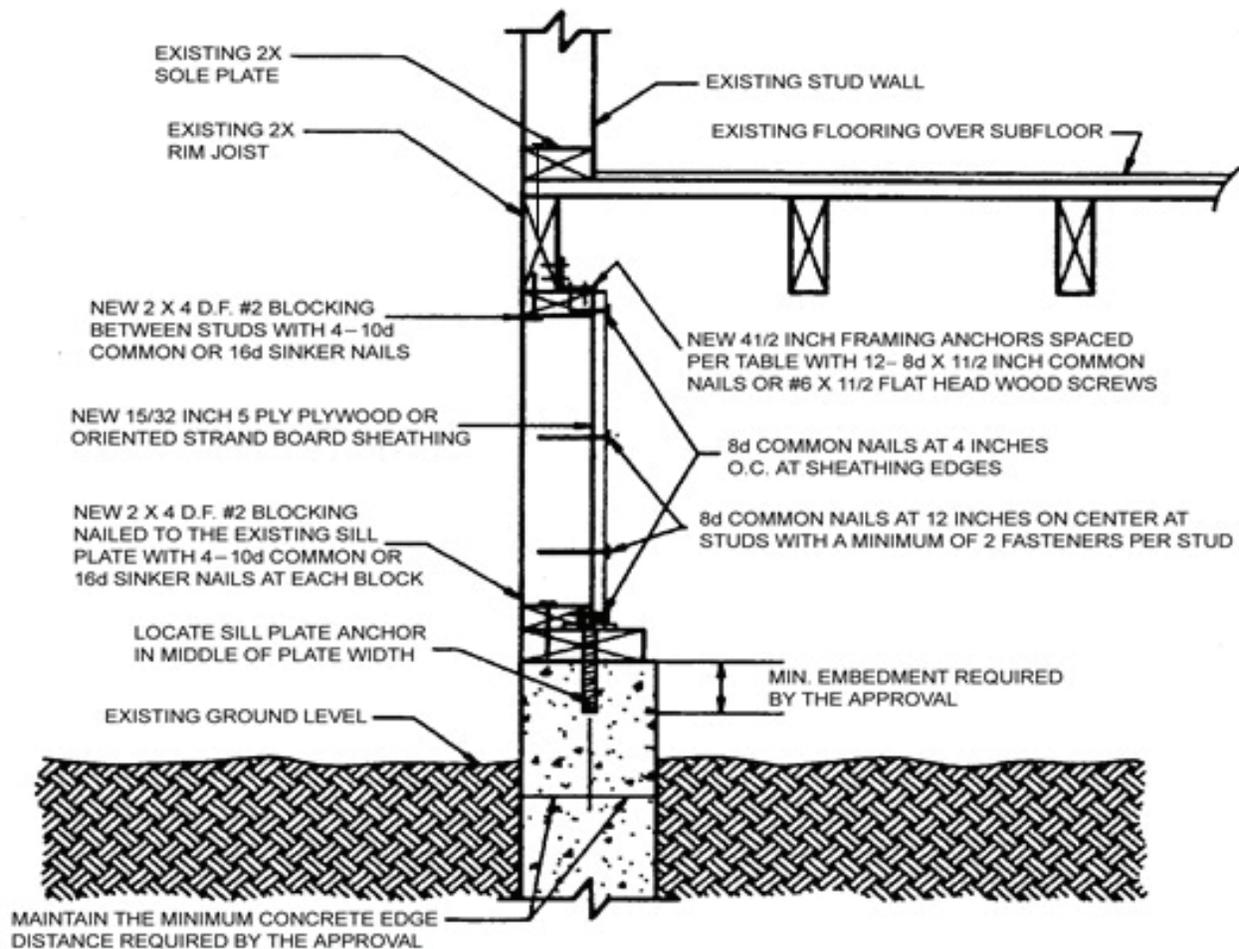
Detail from the Los Angeles Standard Retrofit Plan (See Chapter 6) of a connection between a wall and a horizontal floor diaphragm, with strengthening of the connection between the top of the cripple wall and the floor joist blocking above the wall (from ATC, 2002).
